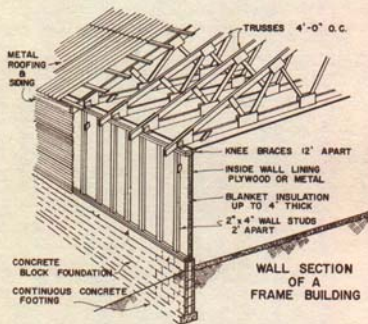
Vertical 2 x 4's placed 24 inches on center with poured concrete or block foundation.
